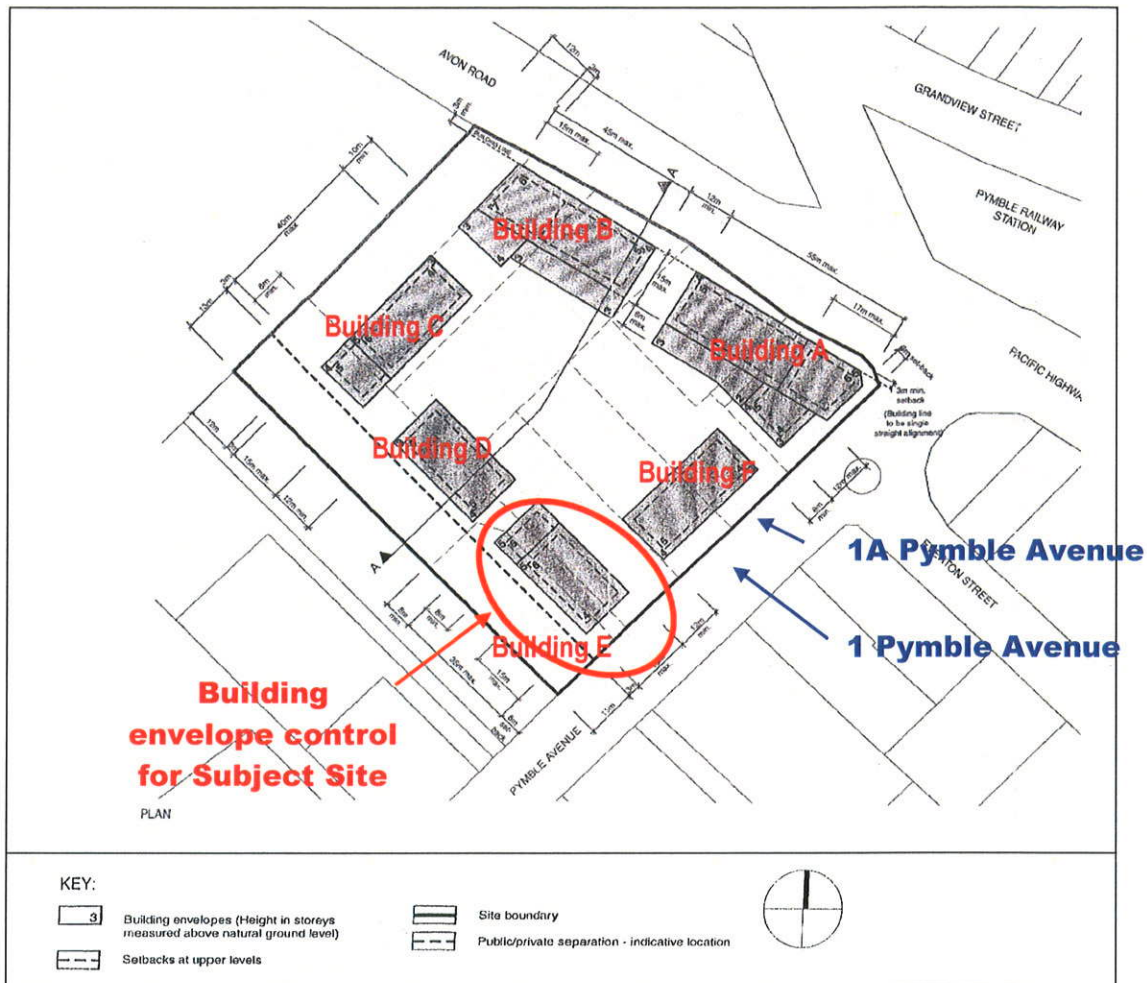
SEPP 53 Ku-ring-gai Reference Plans – Site 1 Building Envelope Control Drawings
